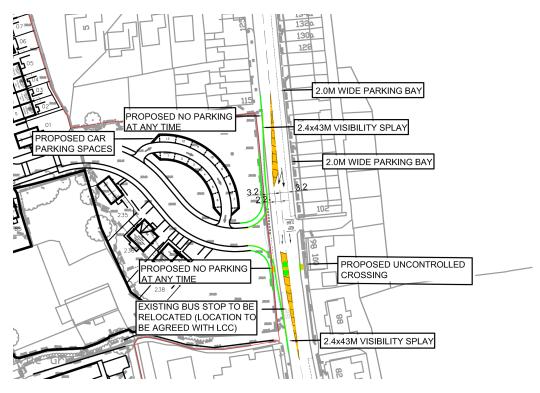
Extract from Applicant's Corridor Improvement Strategy
